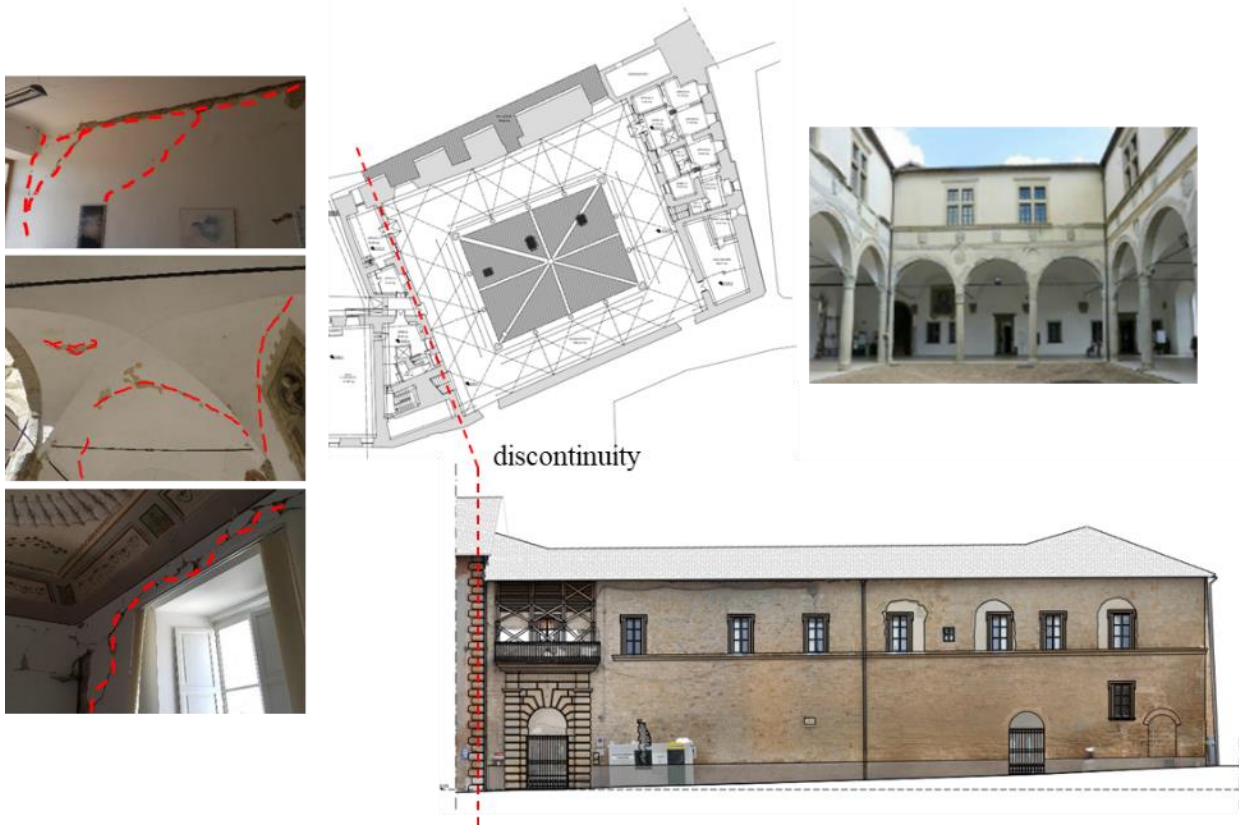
Portico da Varano: (a) damages after 2016 central Italy earthquake (b) plan view $Q = + 0.00$; (c) Nord-West view from Cavour square; (d) internal view
